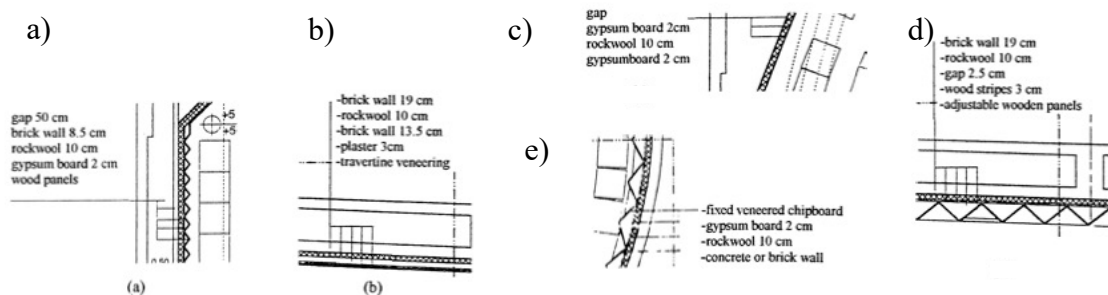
a) back wall (1), b) sidewalls of the main floor (1), c) back wall (2), d) side walls (2), e)chorus wall (2) [8]
